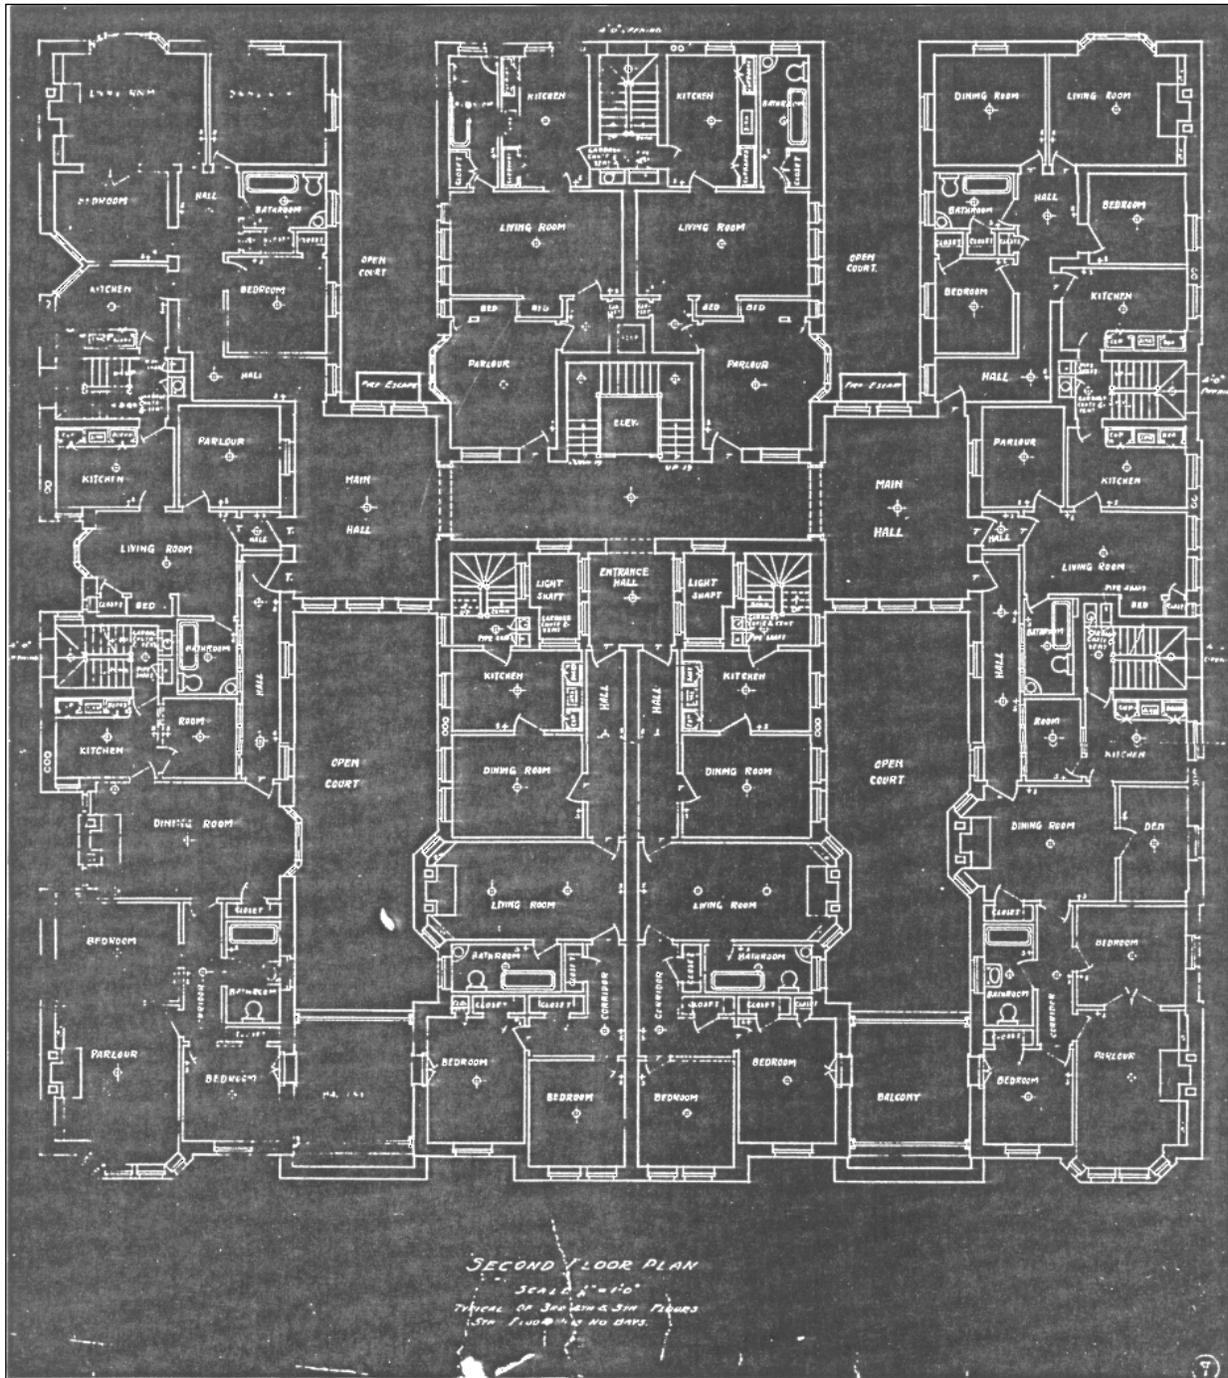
The Princeton Apartments, “Second Floor Plan.” (Reproduced from City of Winnipeg, Architect’s Plans, #1045/1909.)
